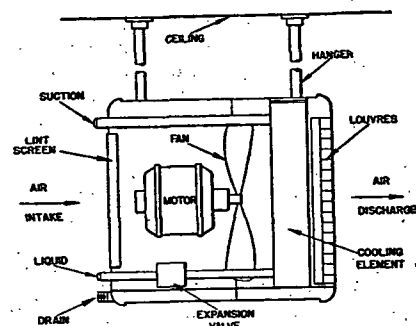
SUSPENDED PROPELLER FAN TYPE UNIT AIR CONDITIONER
